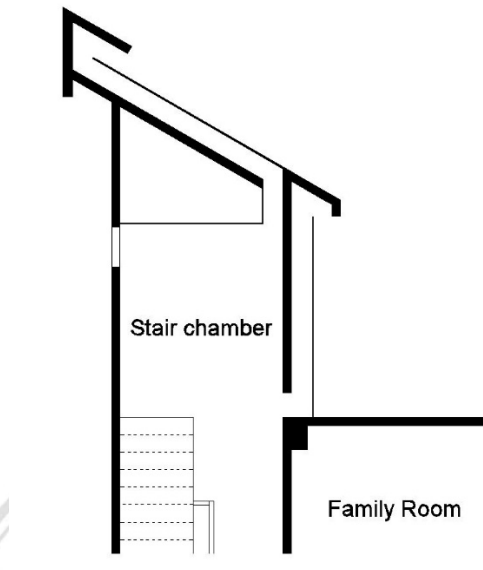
Proposed design about the combination of Trombe wall and roof solar collector
